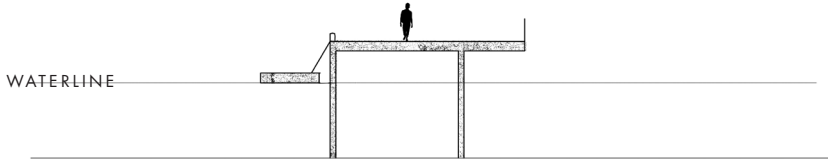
A wooden dock at the foot of the basin providing water access as well as a pathway along the water that doesn't intersect with the road for public transfer that is planned to go through Nyhammen.
